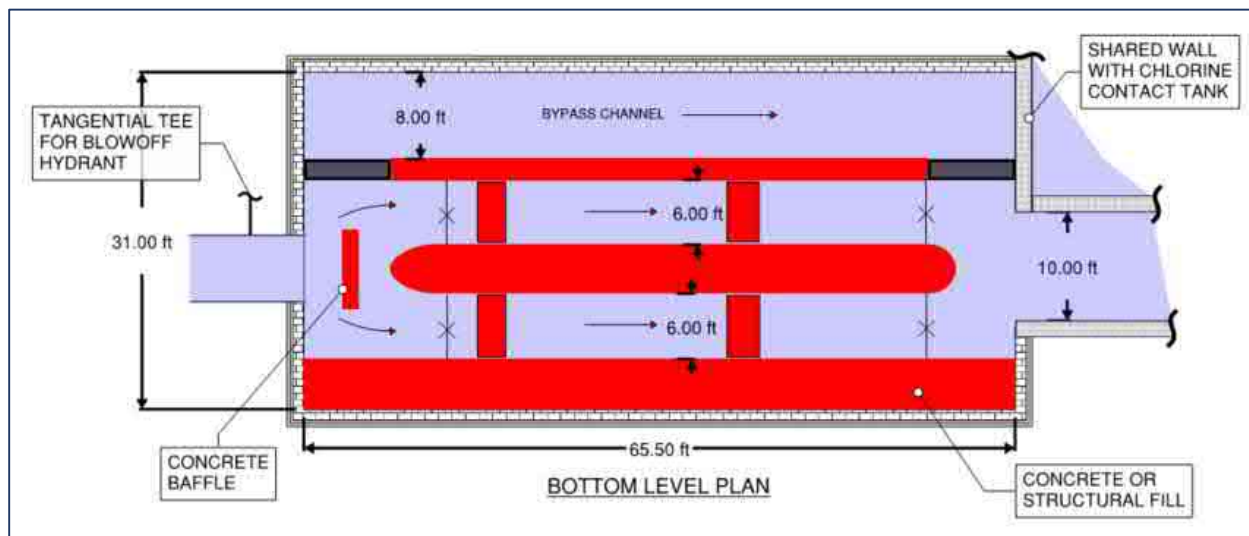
Screening Facility Conceptual Bottom-Level Plan
